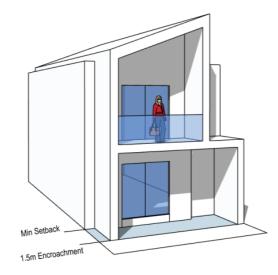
Example with roofed balcony Element. Greater amenity for resident and stronger built form to streetscape.
